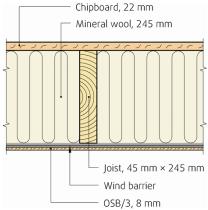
Principle design of suspended ground floors over crawl space or open foundations.
